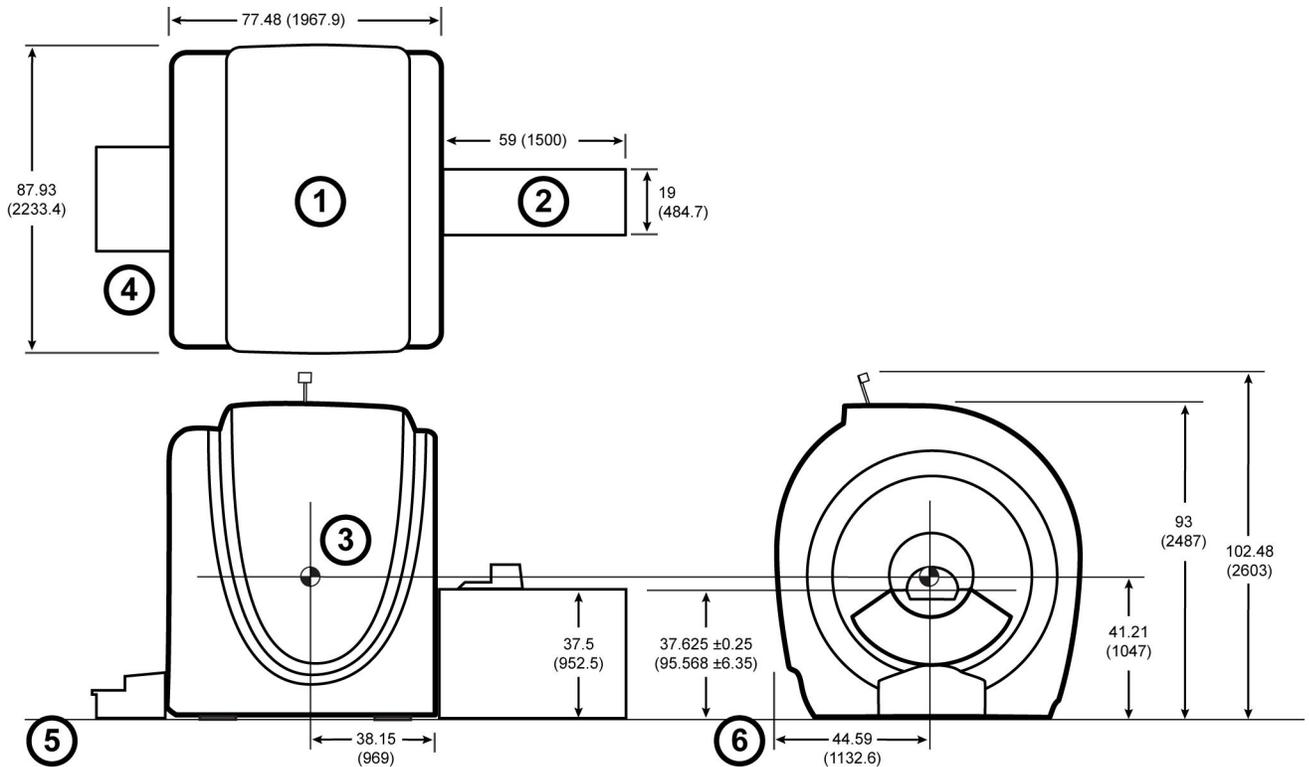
Magnet (MAG) and Rear Pedestal (GEM Covers)
